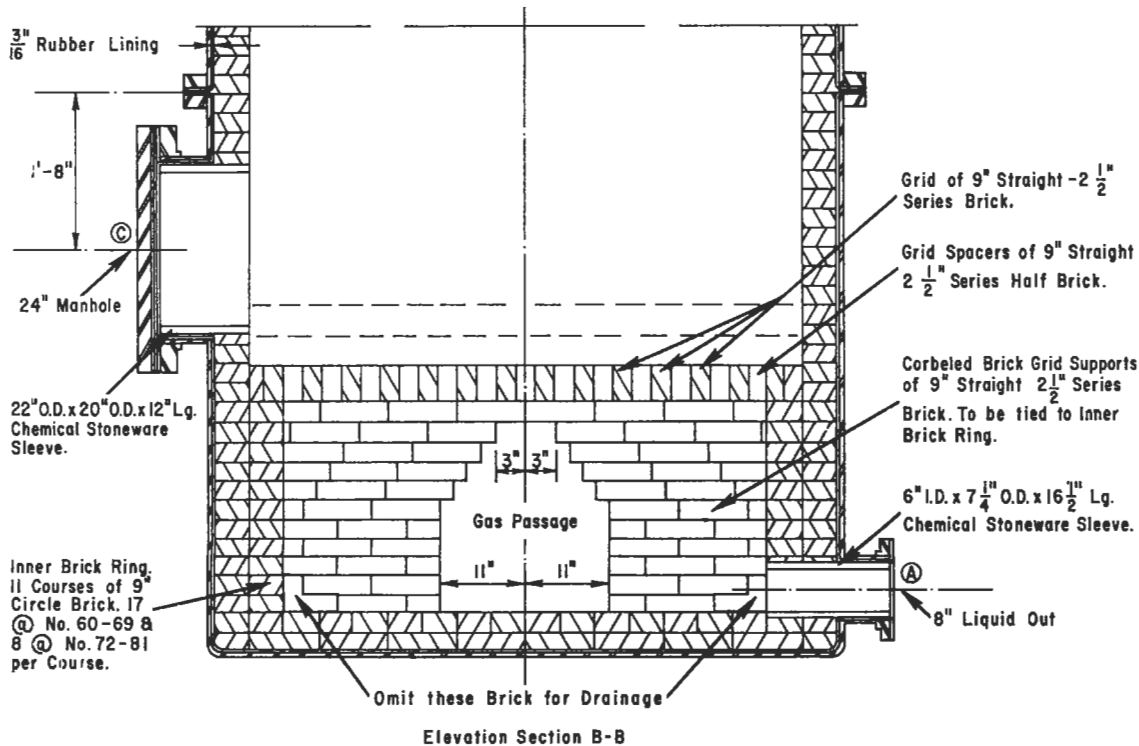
C. Cross-section of membrane and brick-lined packed tower. Depending on tower diameter, certain dimensions should be modified, particularly packing.
